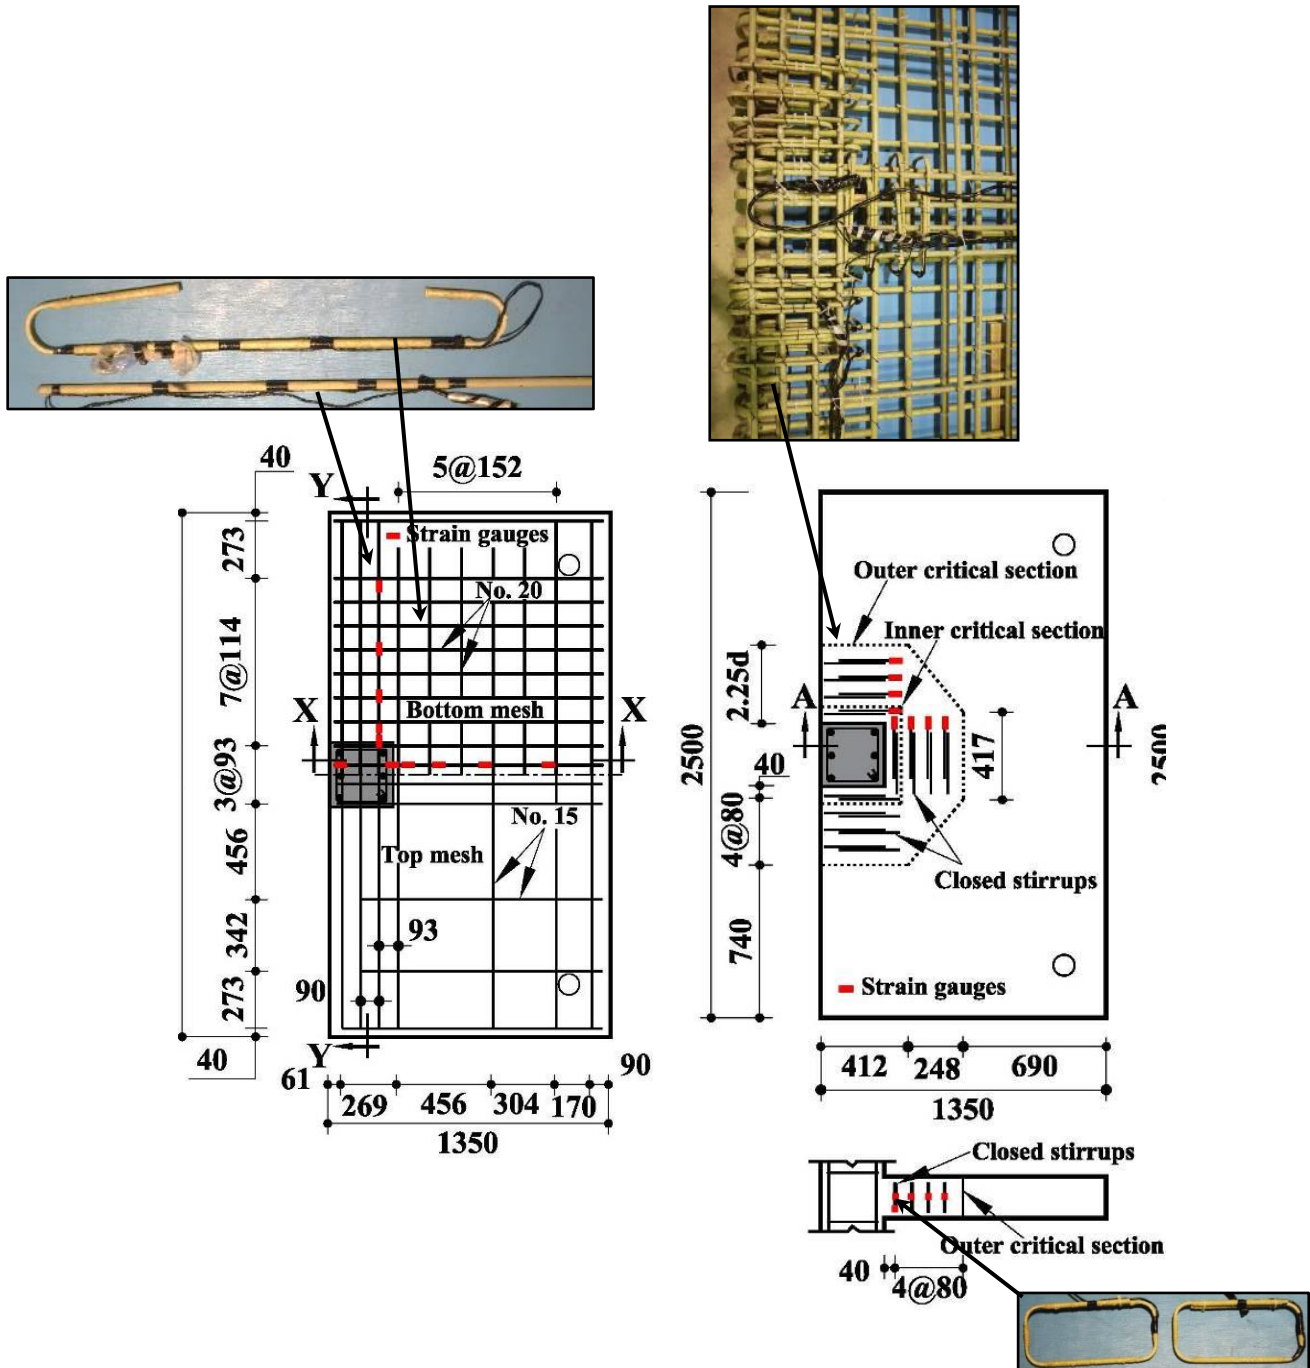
Details of test specimen: geometry, shear reinforcement configuration, and instrumentations (Note: All dimensions in mm)
